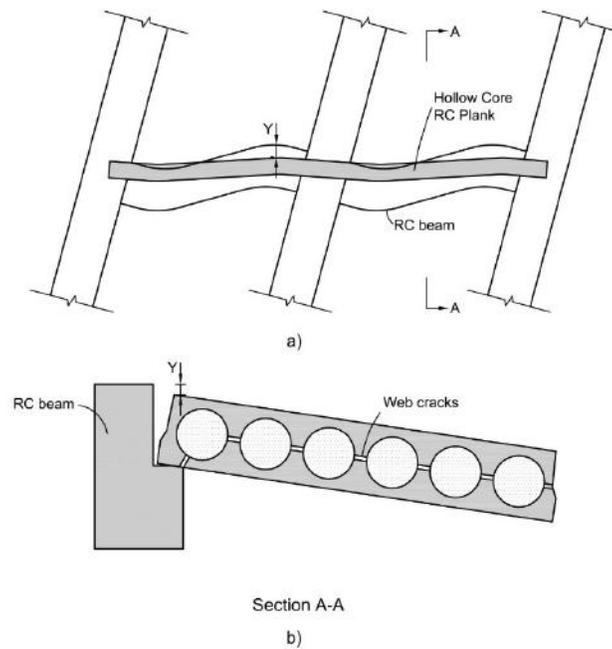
Displacement incompatibility between the perimeter beam and hollow core precast floor slabs in RC framed structures: a) elevation view, and b) section showing horizontal splitting cracks in the webs of hollow core planks (based on SESOC, 2009).
